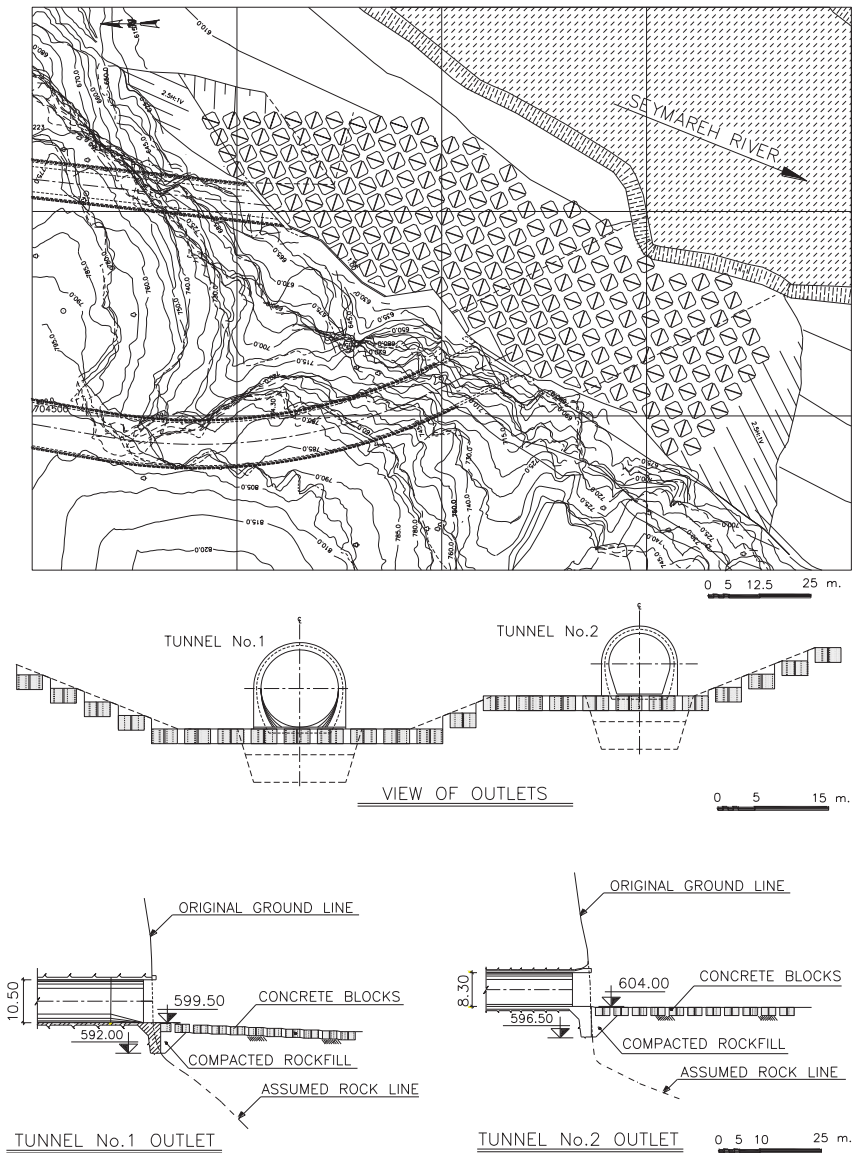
Seymareh Dam in Iran (a) plan, (b) cross-section of concrete prisms placed as erosion protection at diversion tunnel outlets with ① Tunnel 1, ② Tunnel 2, ③ outlet of Tunnel 1, ④ outlet of Tunnel 2, ⑤ original ground line, ⑥ concrete blocks, ⑦ compacted rockfill, ⑧ assumed rock line (Emami *et al.* 2006a)
